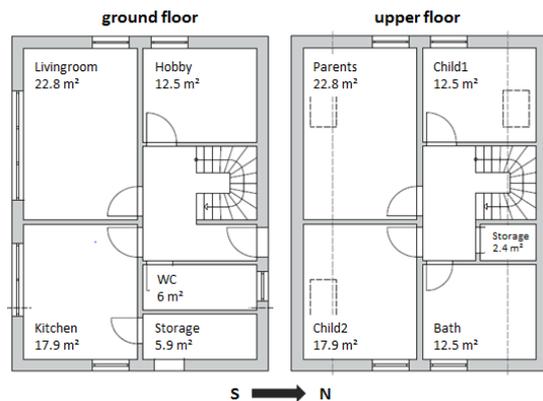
Floor plan of the typical one-family dwelling in AixLib
